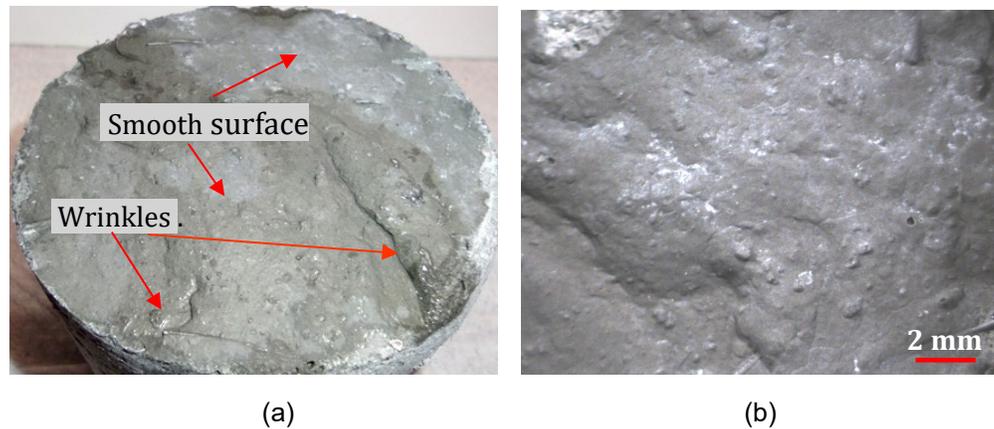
Typical NP surface: (a) core section photograph; and (b) stereo microscope photograph.
